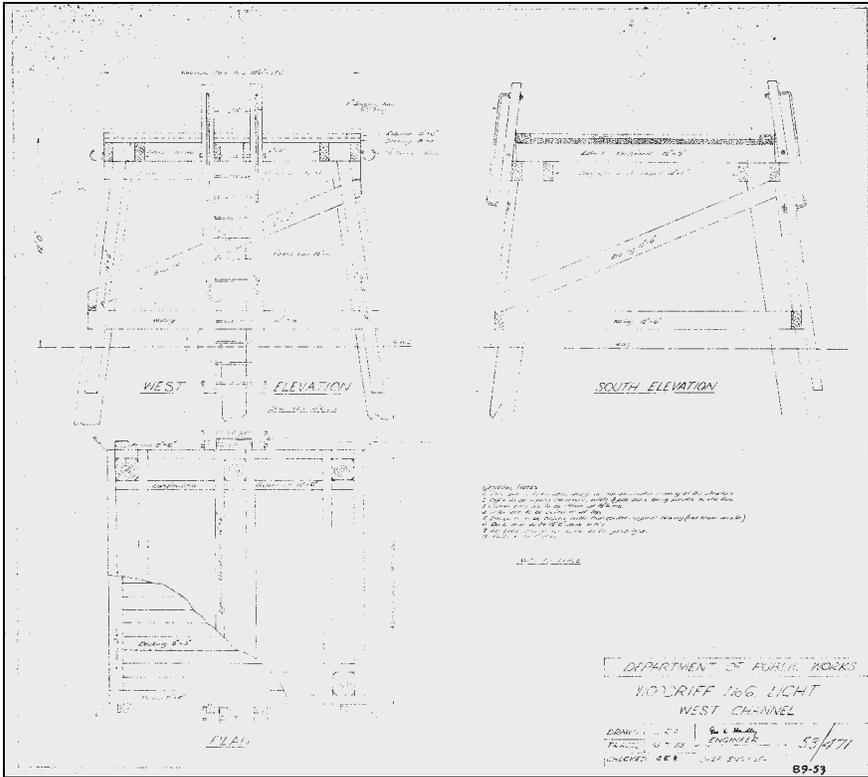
39: Plan of Woodriff #6 West Channel Light (DPW 53/471:1953, QMM Collection).
